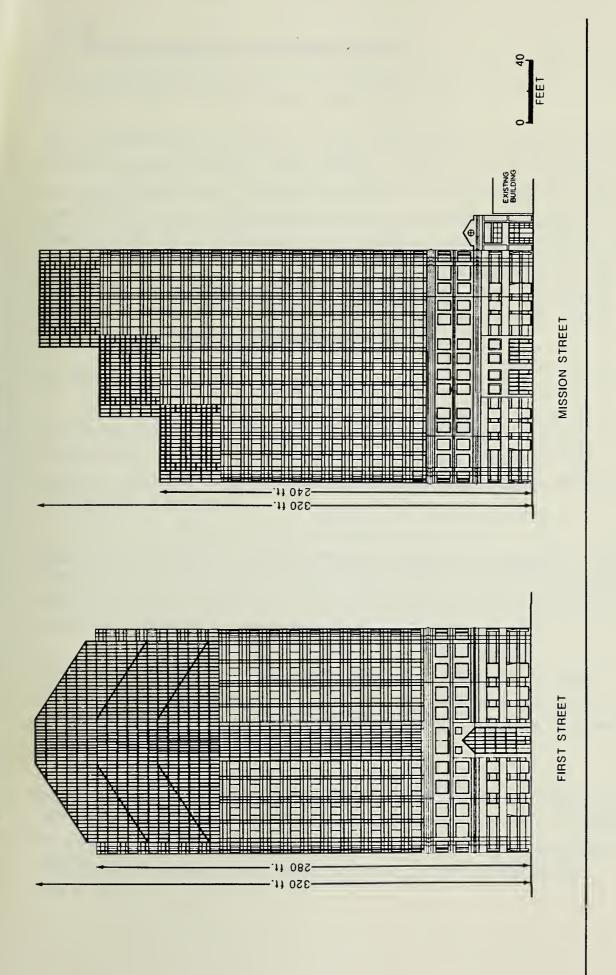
FIRST AND MISSION STREET ELEVATIONS 100 FIRST STREET
